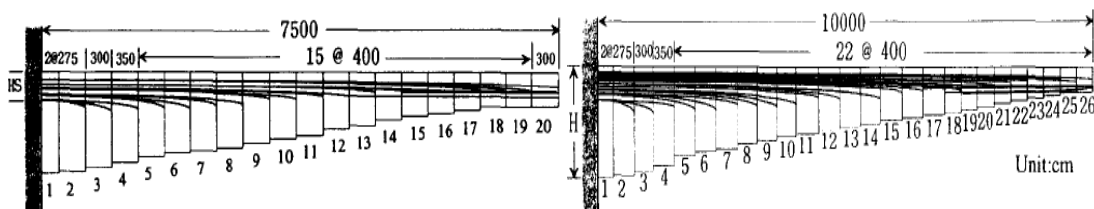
Layout of segments and cantilever tendons (EX1, EX2)
